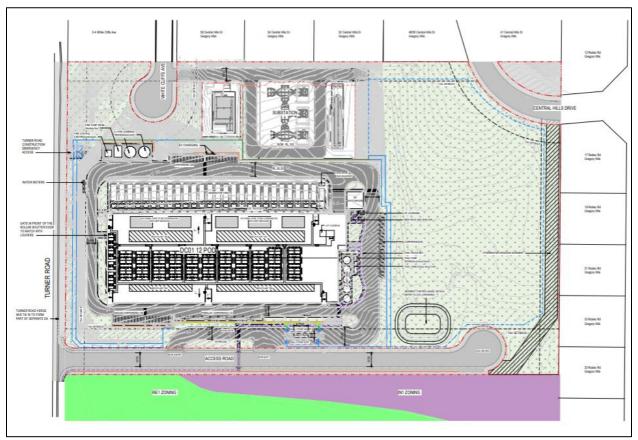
Site Plan for SSD-68013714 (Source: Greenbox Architecture, 2024)
